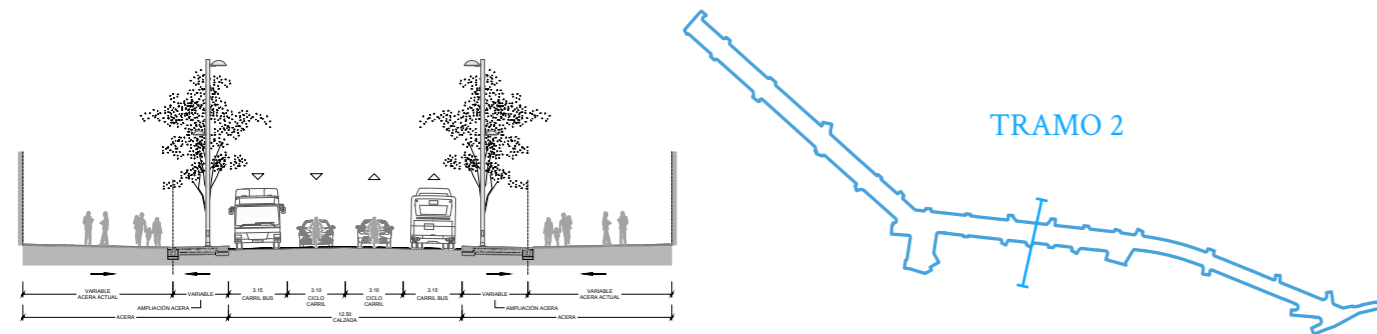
Standard plan and cross-section of the remodelling project. Section 2: Calle de Silva, Plaza del Callao, and Calle de la Abada - Source: Ayuntamiento de Madrid
